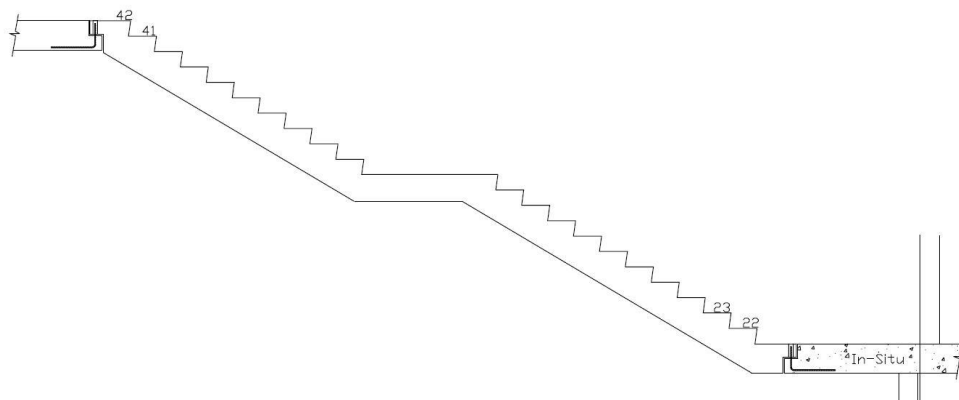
a. Section through stairs showing general arrangement and halving joints.
